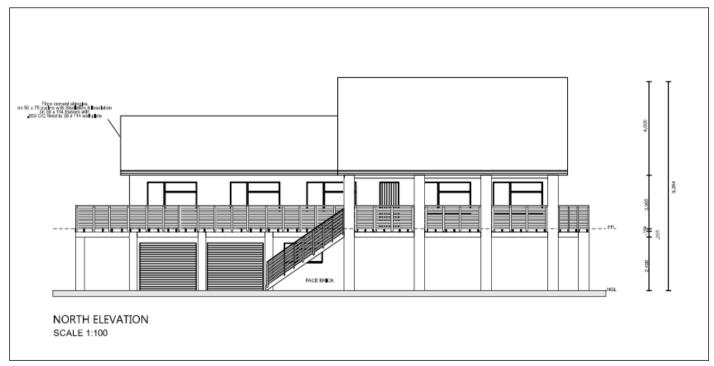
North Elevation of Proposed Mannagers Cottages (Louw Designs, 2023)
